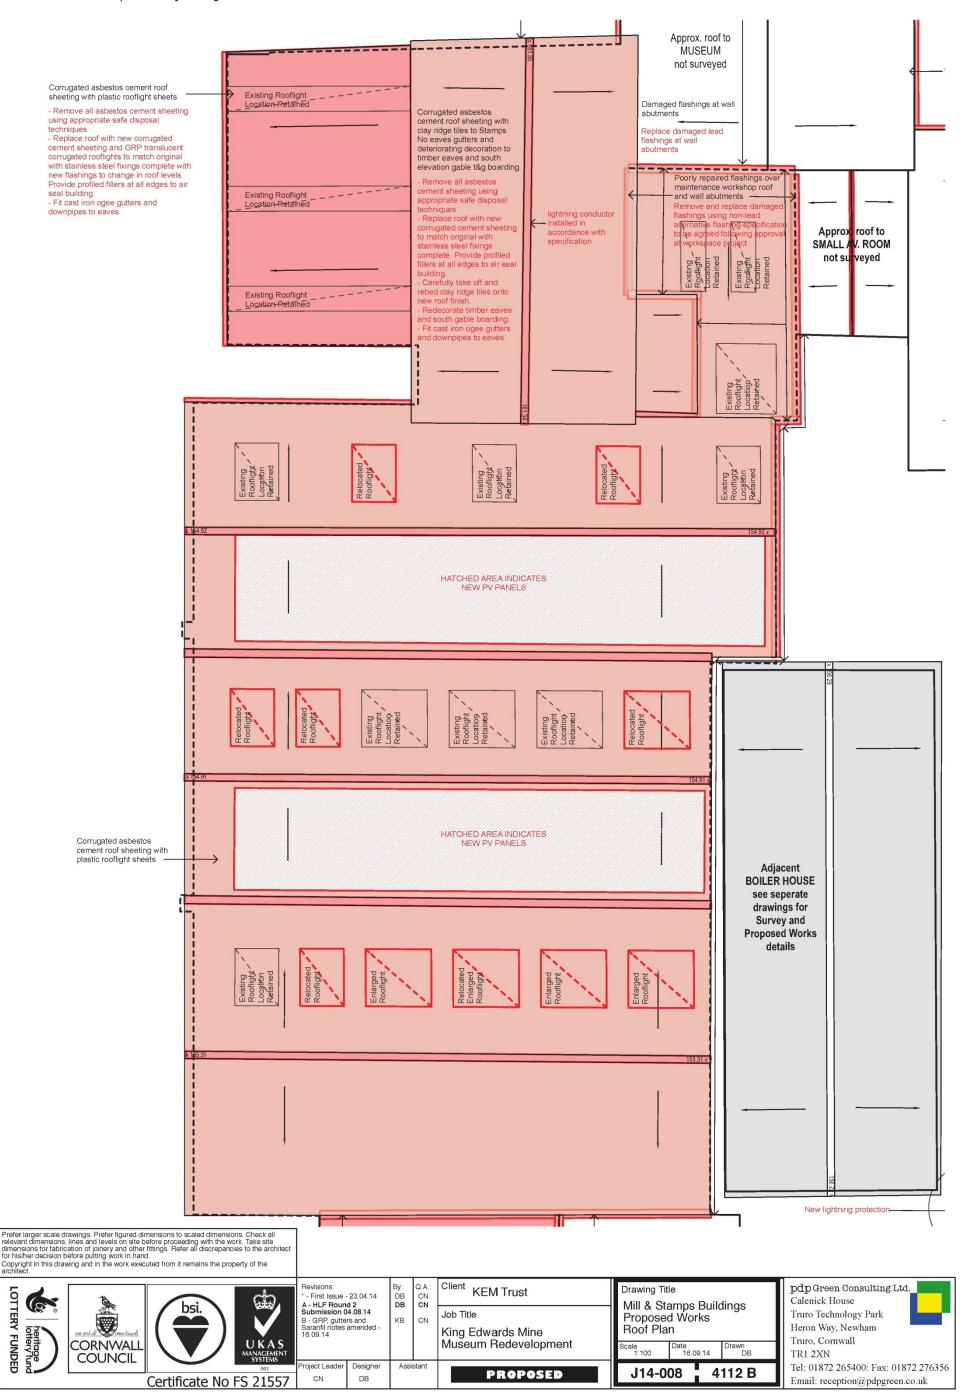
Roof plan of the Mill and Stamps proposed works (PdP Green Cons. Ltd Dwg No. 4112B)
